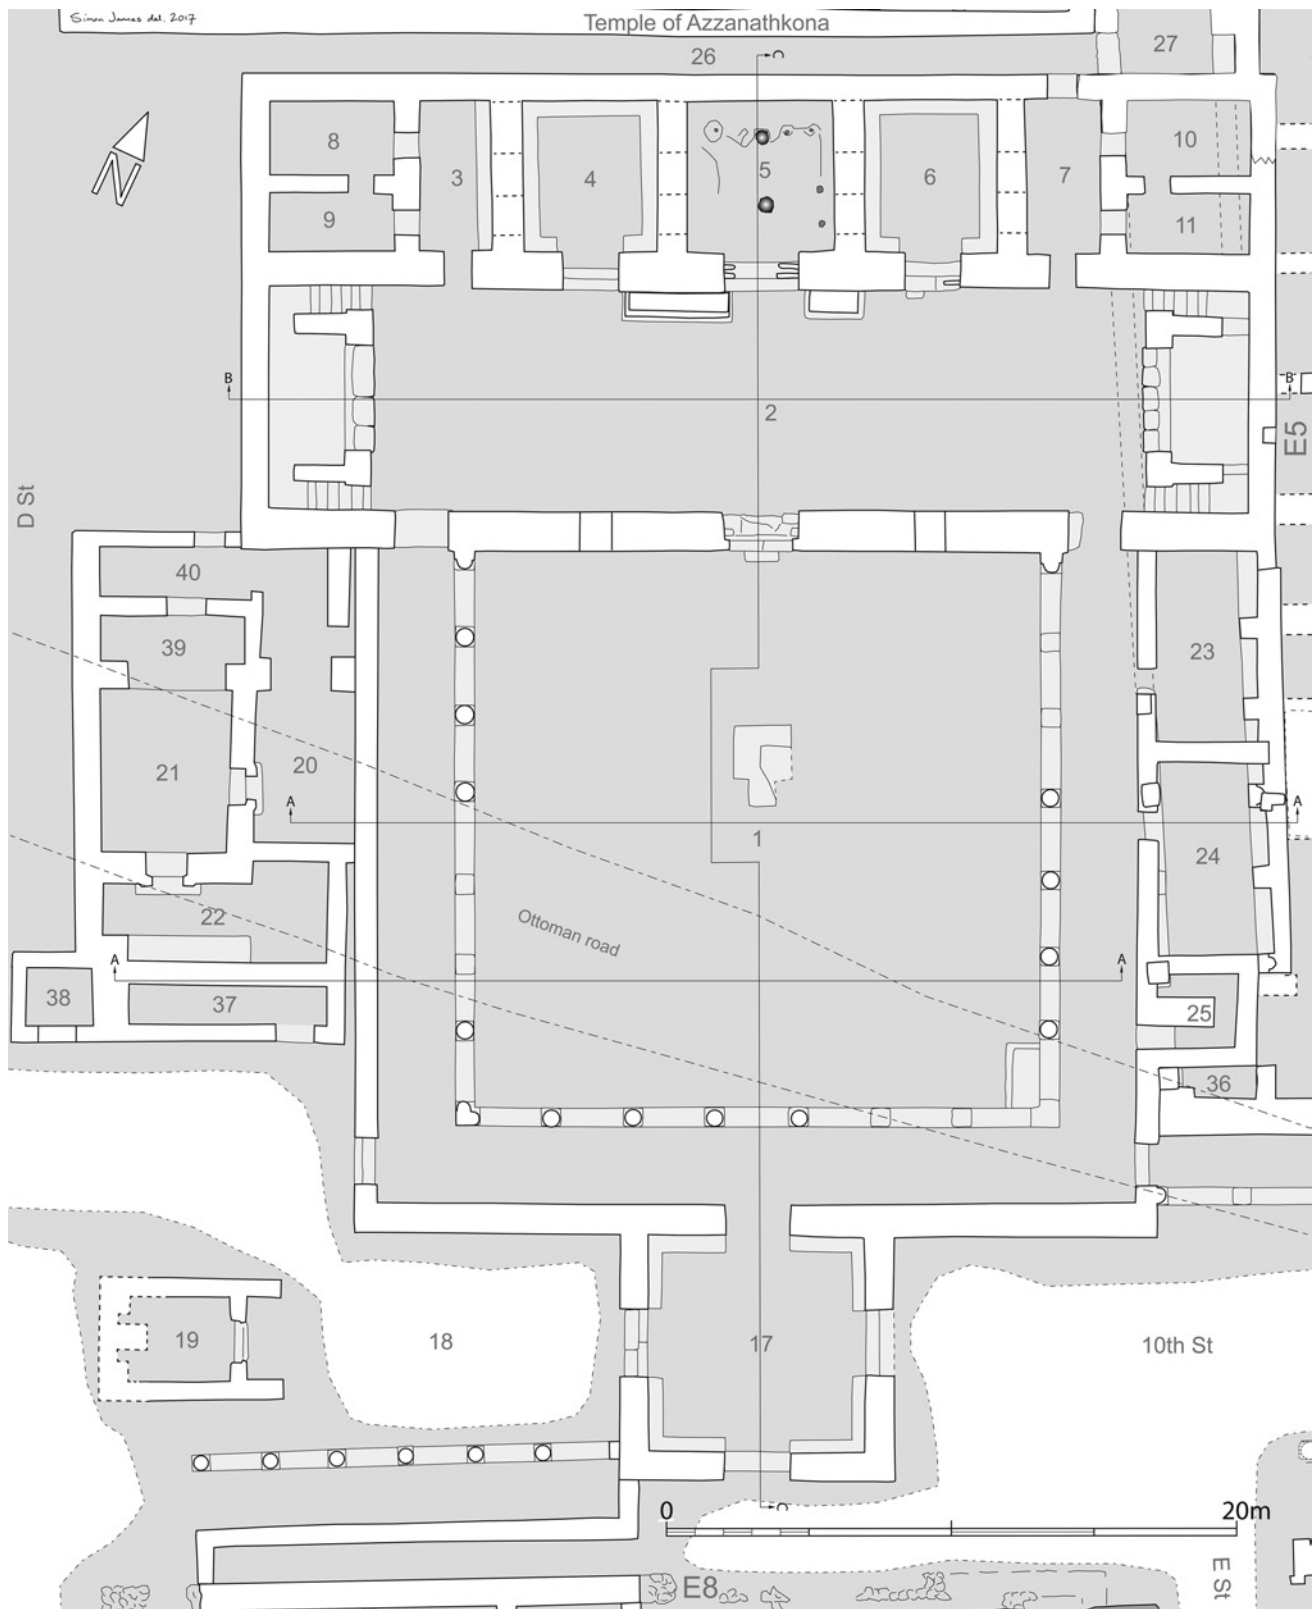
Plan of the *principia* and surrounding structures, based on archival plans and new survey.
